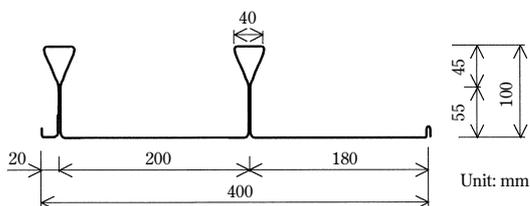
Sectional shape and dimensions of Hi-Deck R-100
